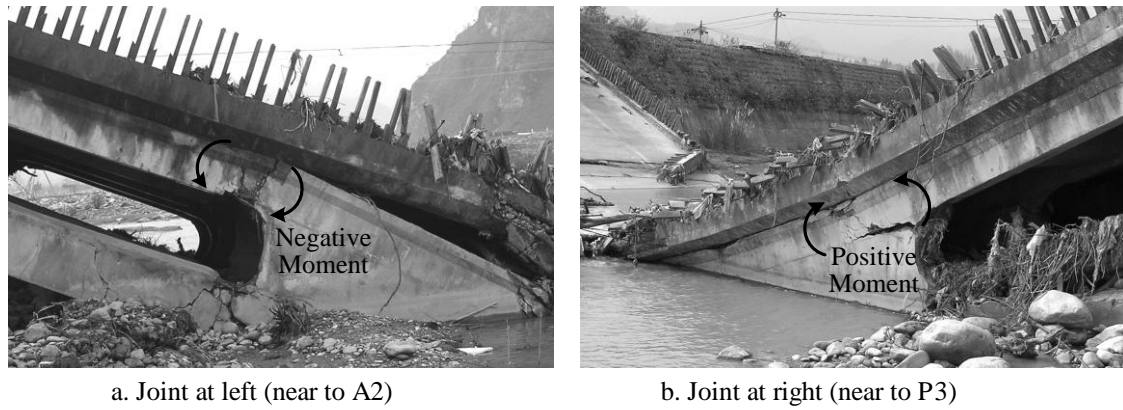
Details of failure at joints of girder and arch leg (view from downstream)
